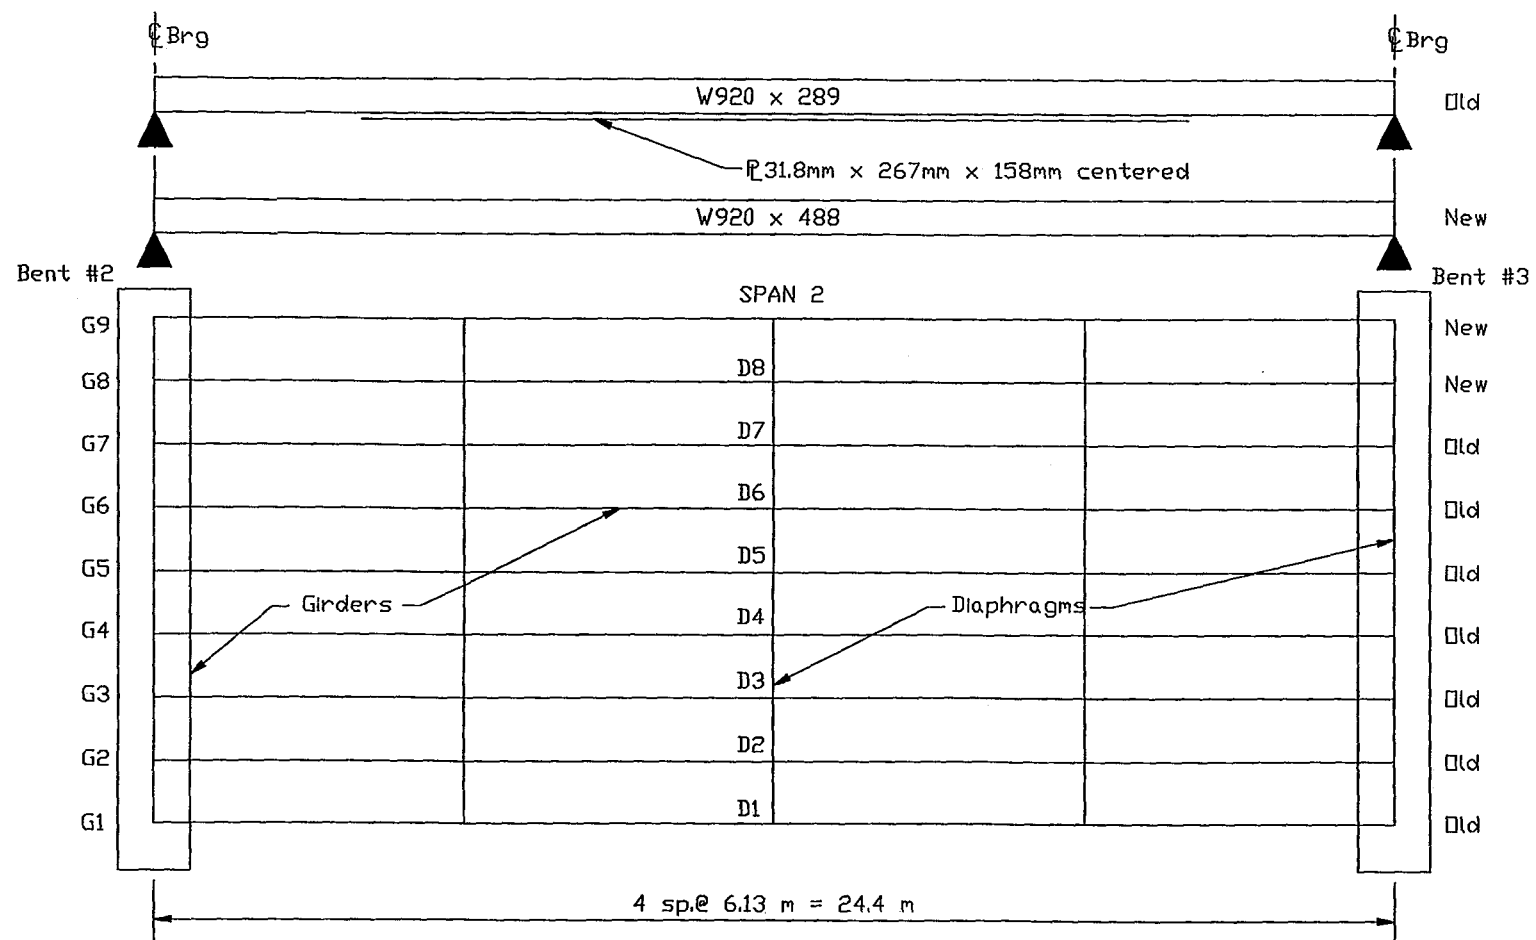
Plan View and Girder Details for the 24.5 m Simple Span
